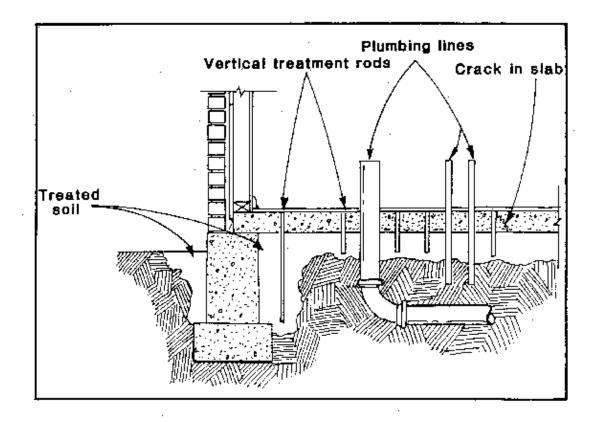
Treatment under Concrete Slab with Vertical Rodding at Joints, Cracks, and Openings Around Plumbing.
